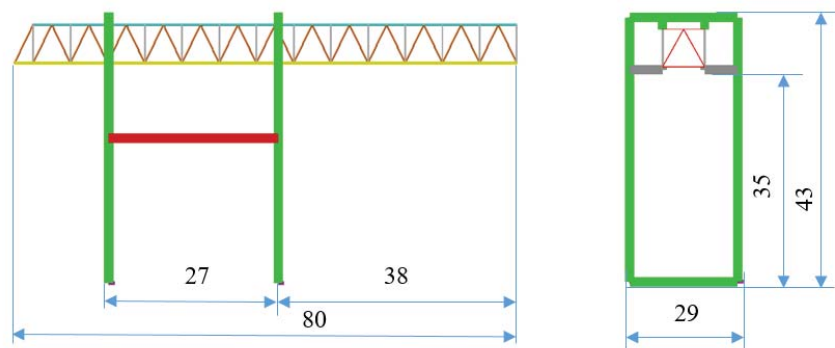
Main geometrical dimensions [m] for ship to shore low profile container crane.
